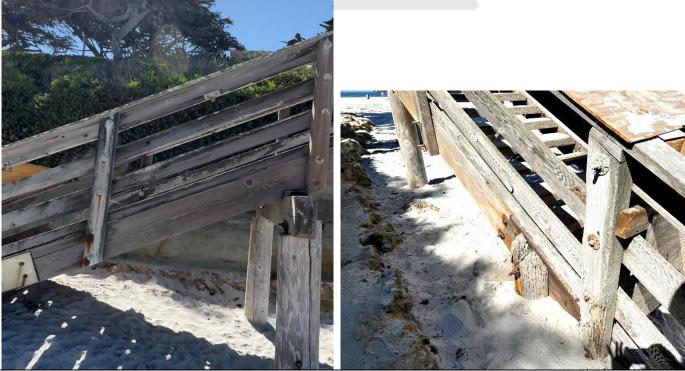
Stair 4 Guardrail Post/Split Stringer from Landing to Bottom of Stairway
